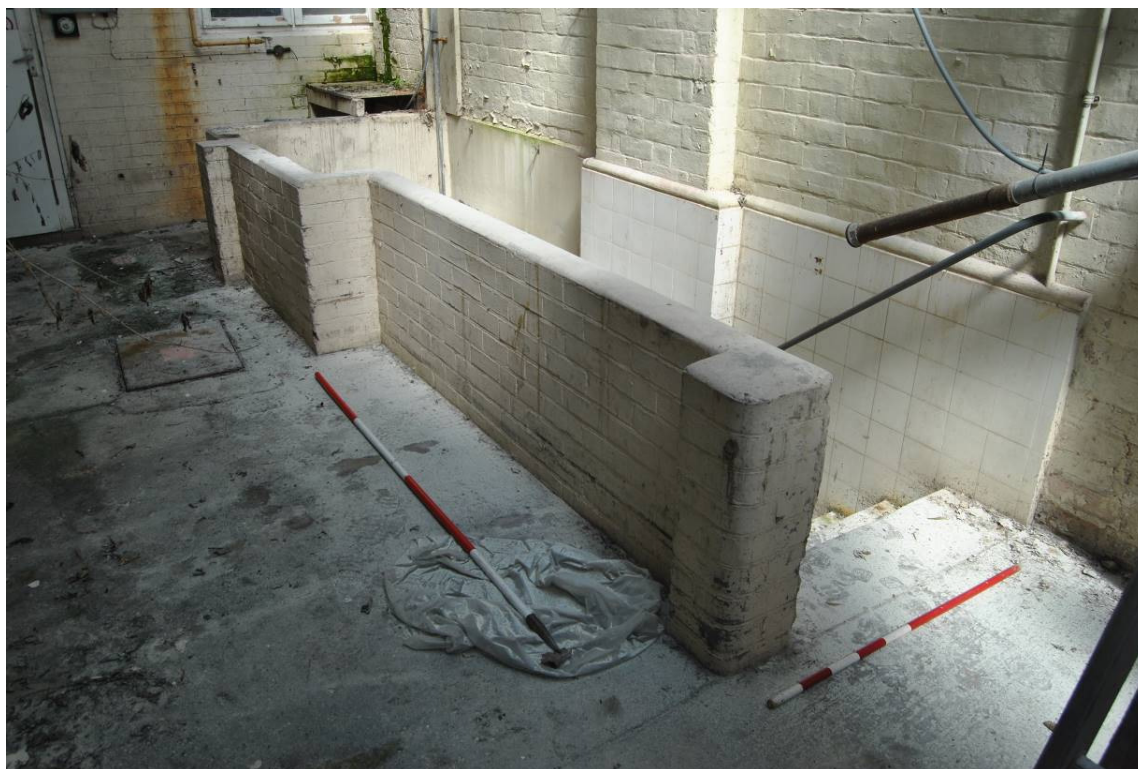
Building A, stair descending to showroom basement at east end of south elevation.
